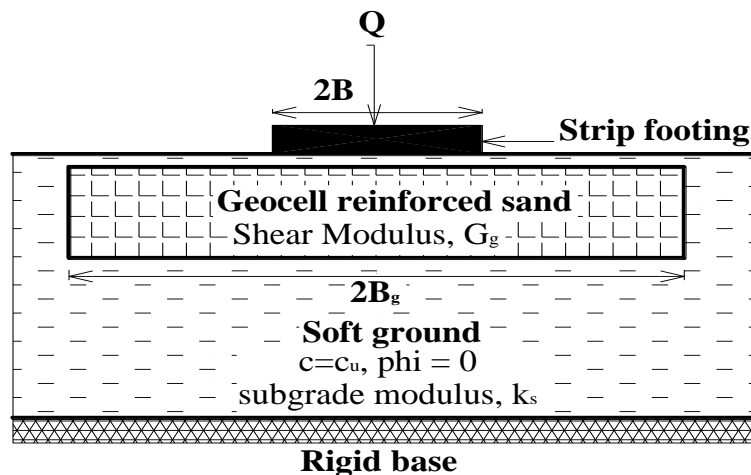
Definition sketch of strip footing on geocell reinforced foundation bed
